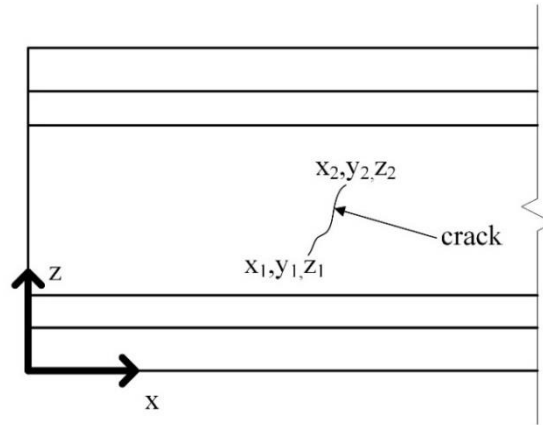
Illustration. Location of local element origin and defect coordinates on concrete I-beam—elevation view.
